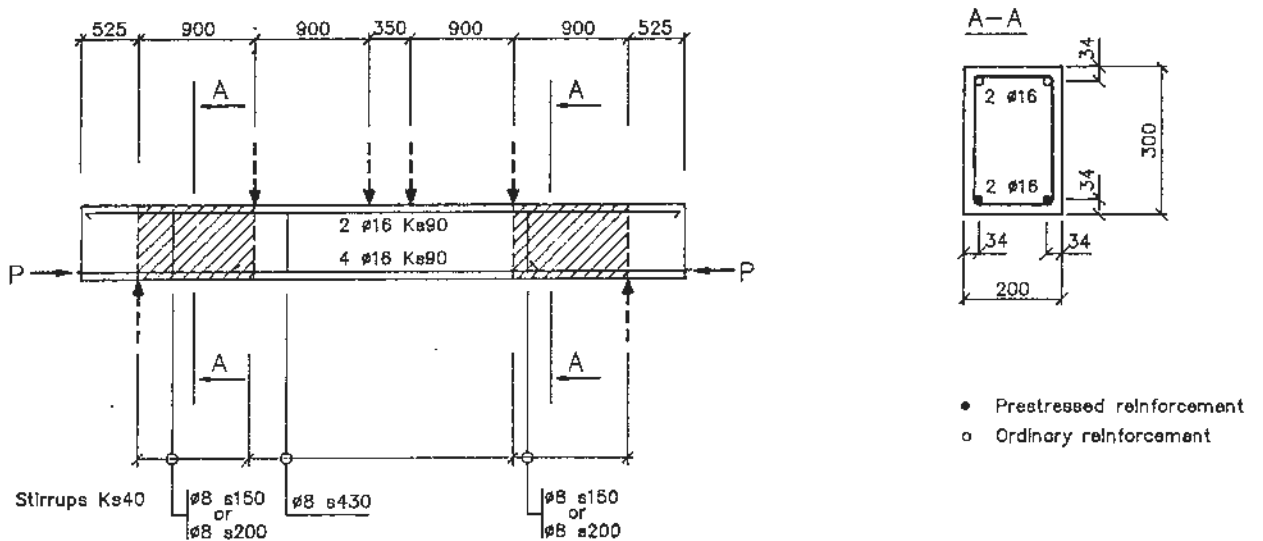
Test beams - Type (B). The figure shows only beams with shear reinforcement in the test area
